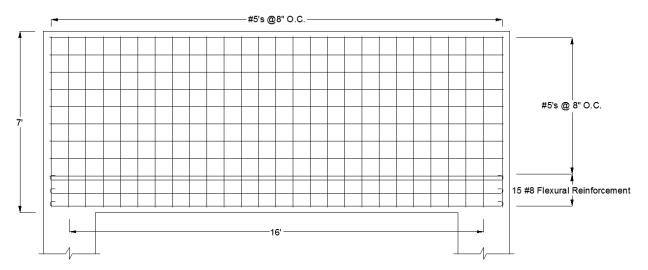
Deep Beam Method Design Example 3 – Longitudinal Cut Section
